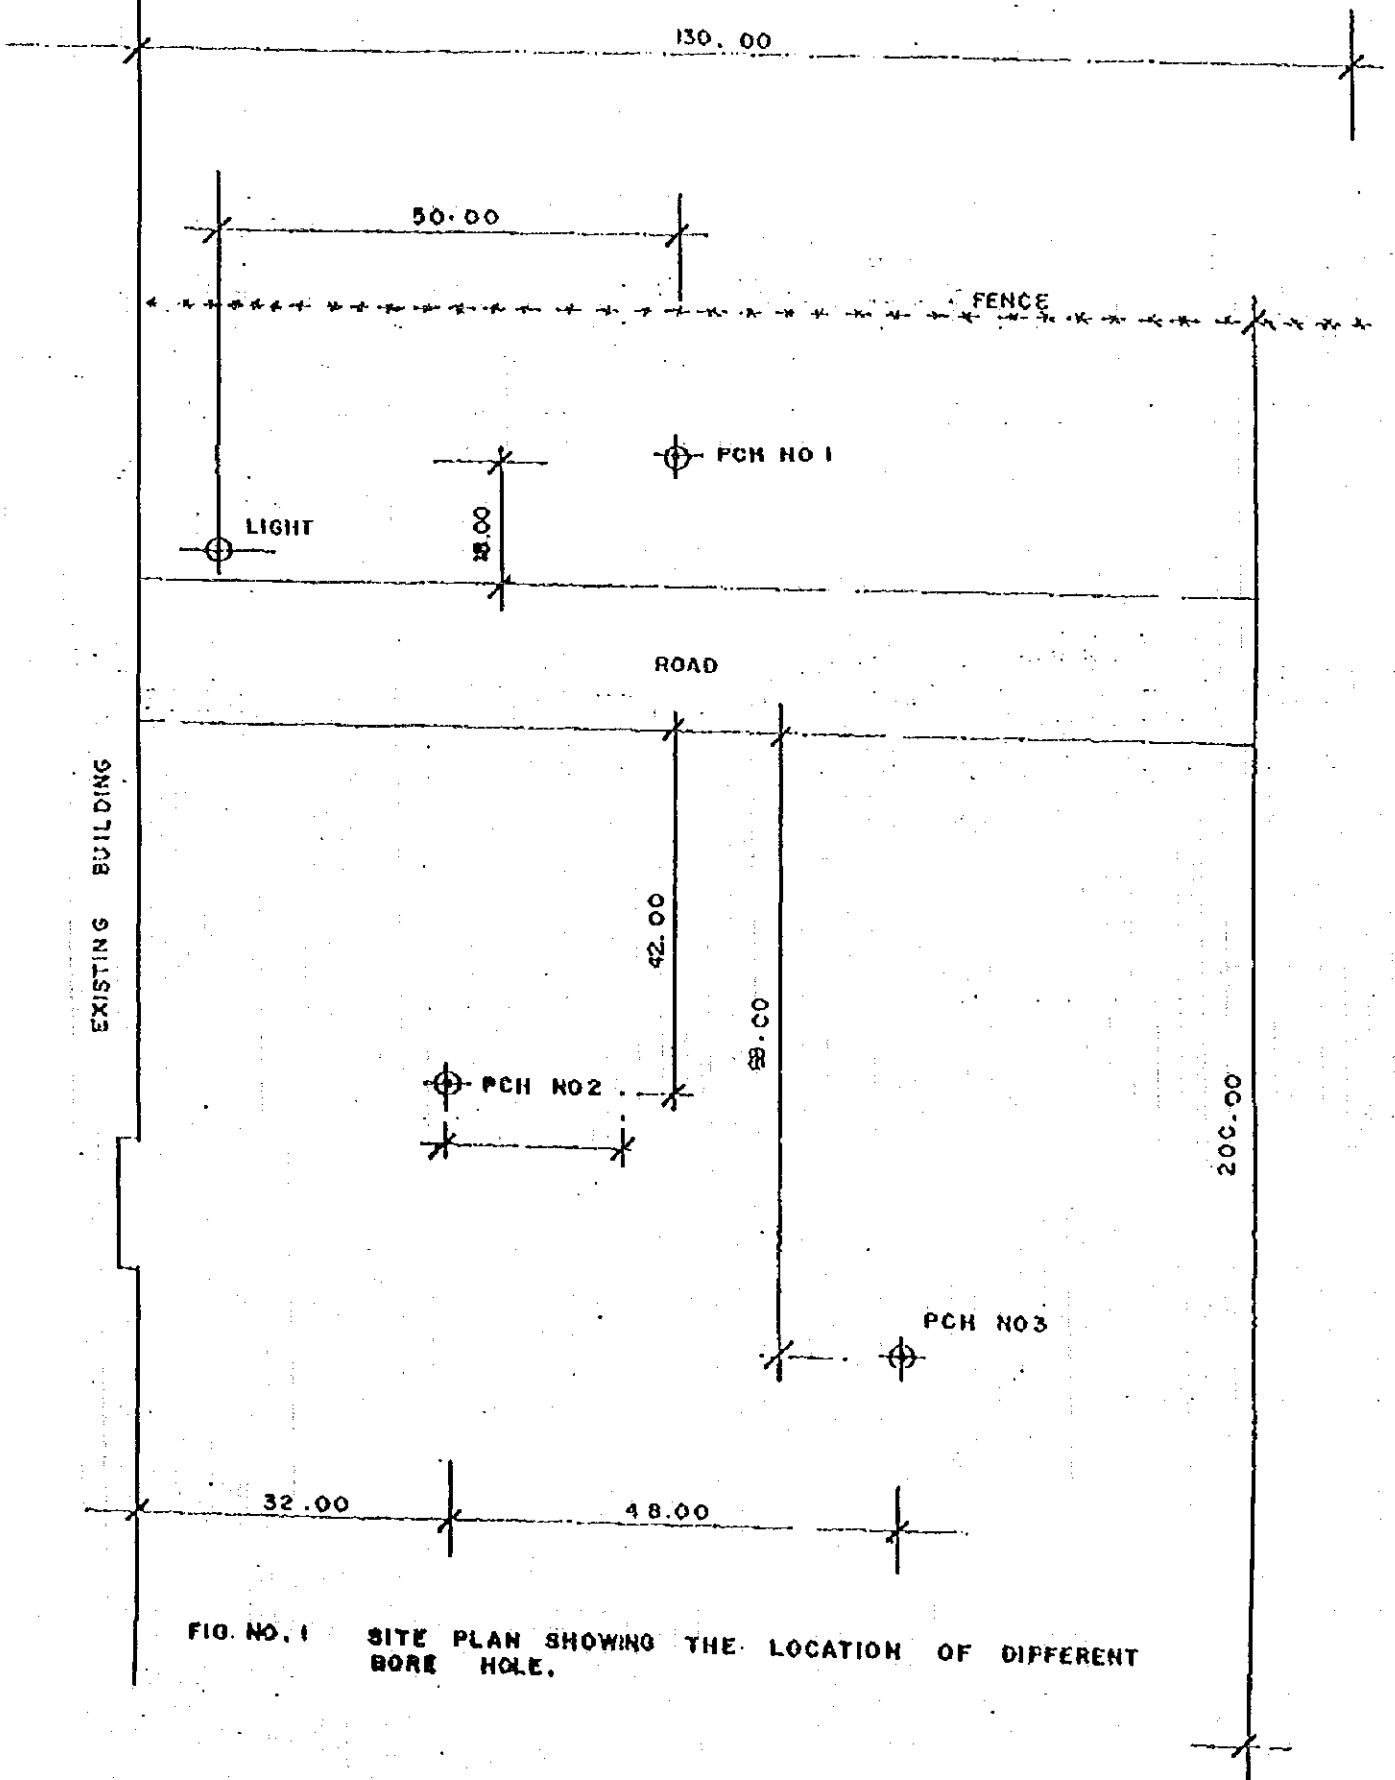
SITE PLAN SHOWING THE LOCATION OF DIFFERENT BORE HOLE.
